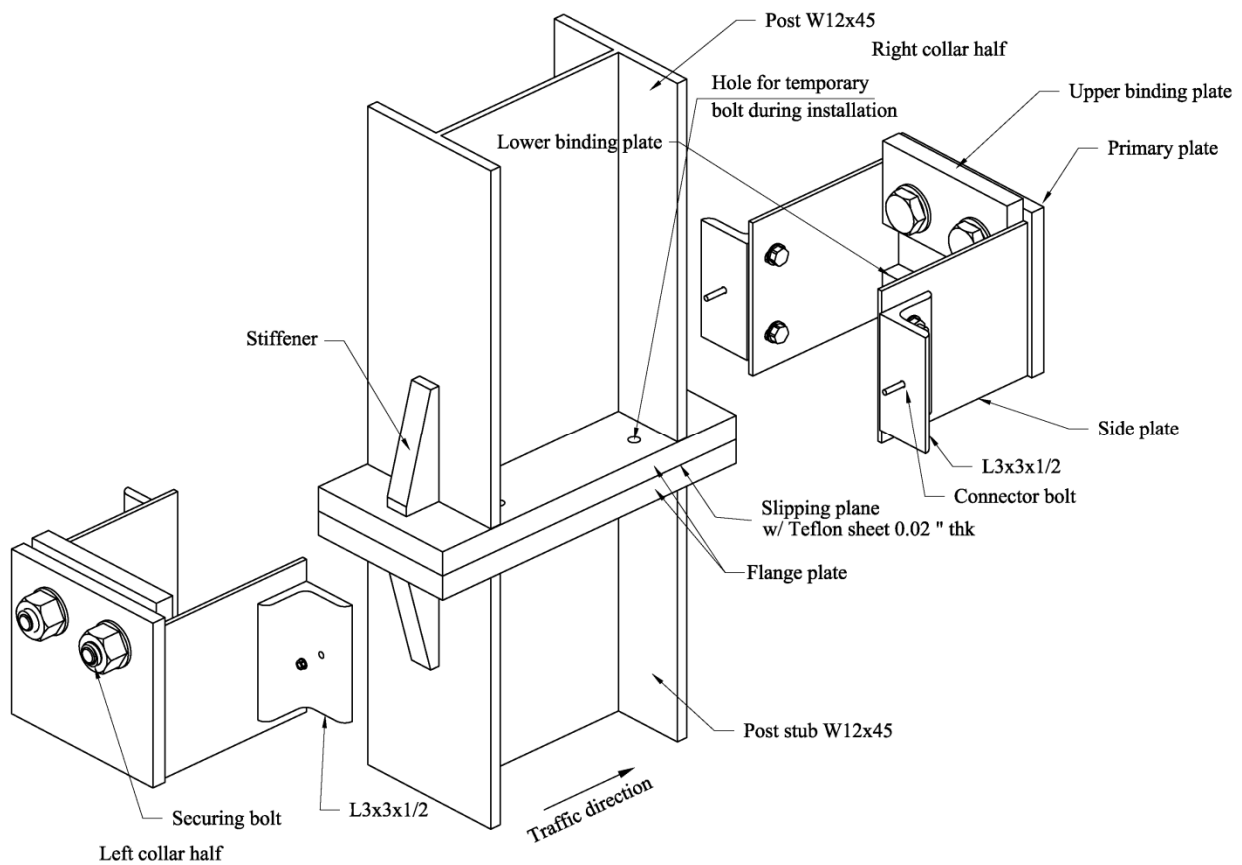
Exploded view of the shear-controlled moment collar connection
